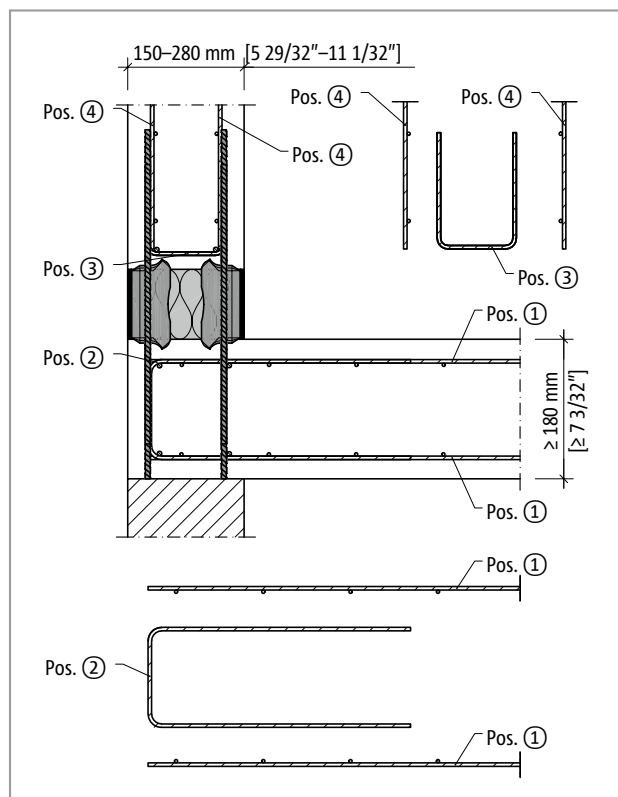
Schöck Isokorb® CXT Type CA: On-site reinforcement
